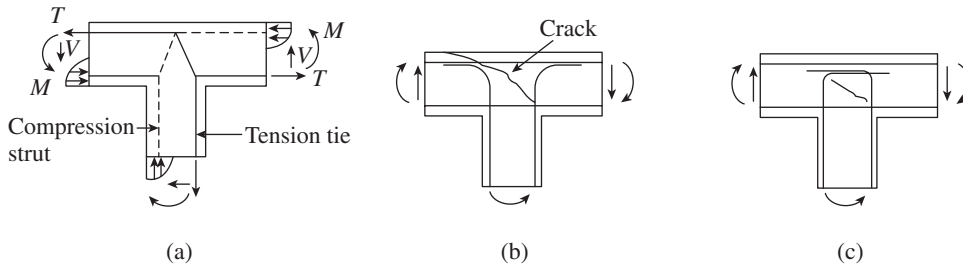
T-joints (a) Forces and strut-and-tie model (b) Poor detail (c) Satisfactory detail
